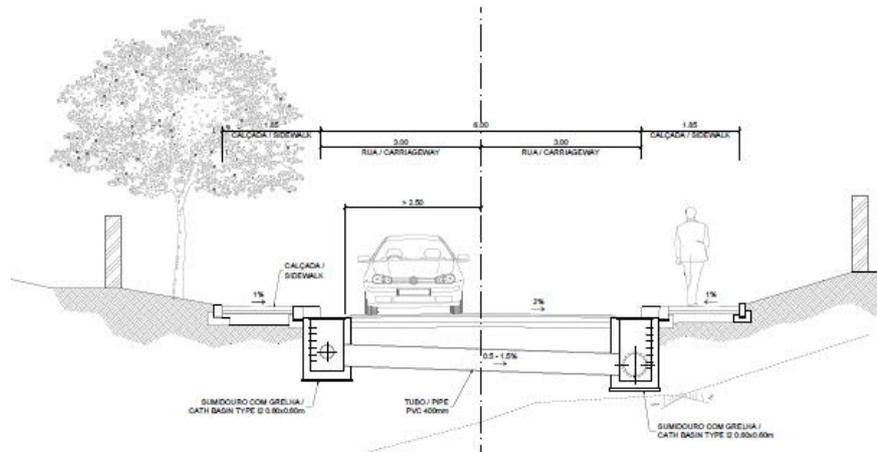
Typical section Lagarto Bay (1+880 – 2+420).
